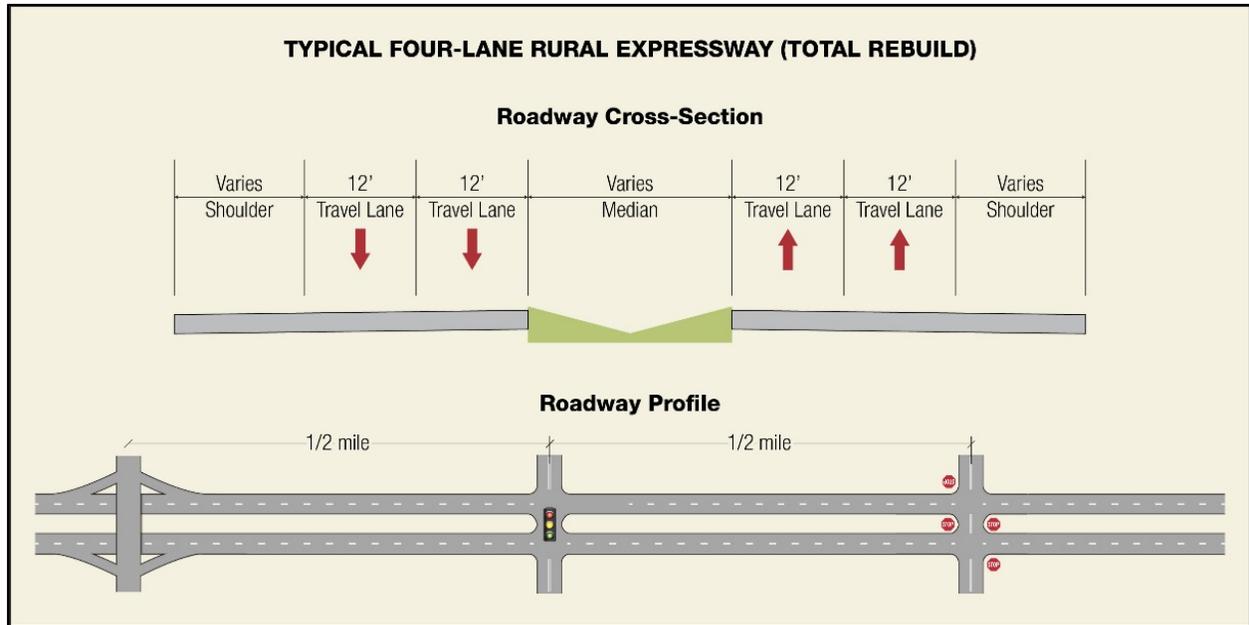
Typical Four-Lane Rural Expressway (Total Rebuild) Roadway Profile and Cross-Section
